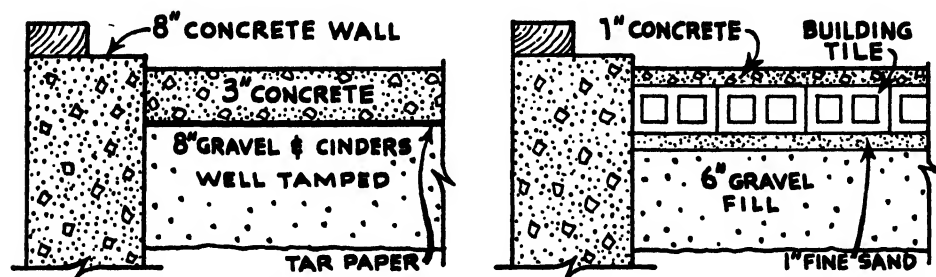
Two styles of laying house floor construction. (*Everybody's Poultry Magazine*)
